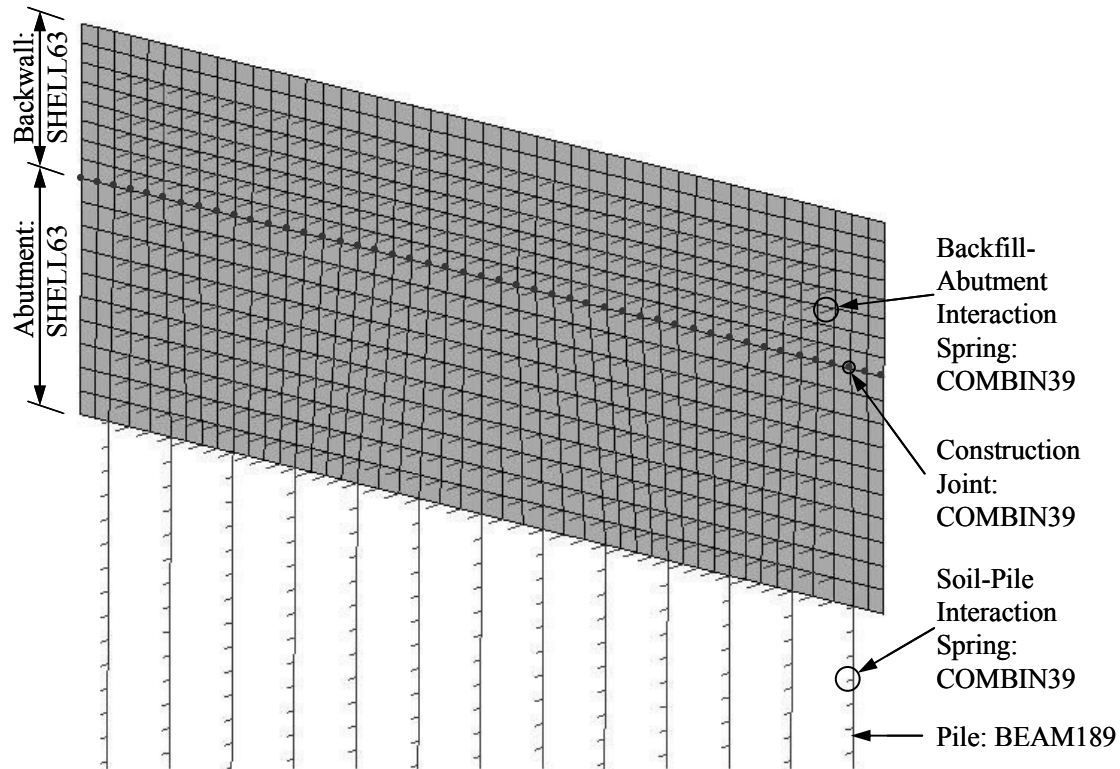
Example 2 3D Abutment and Back-wall – Viewed from Backfill
